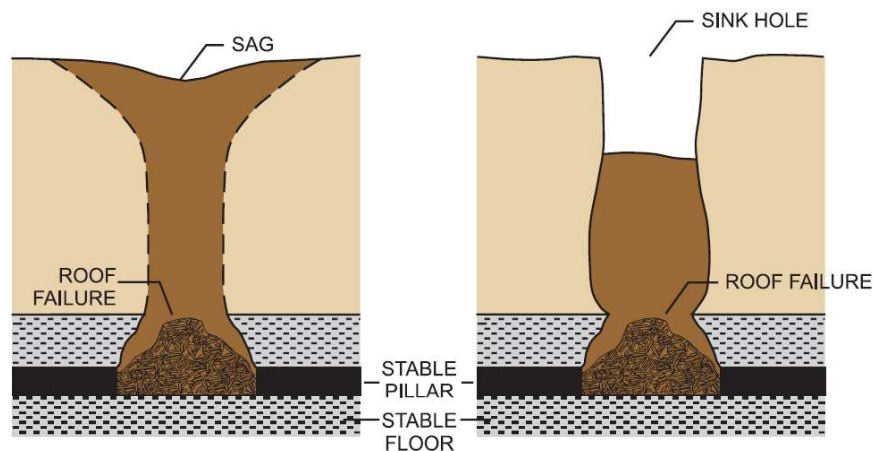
Roof Failure above Mine Room (Marino Engineering Associates)
